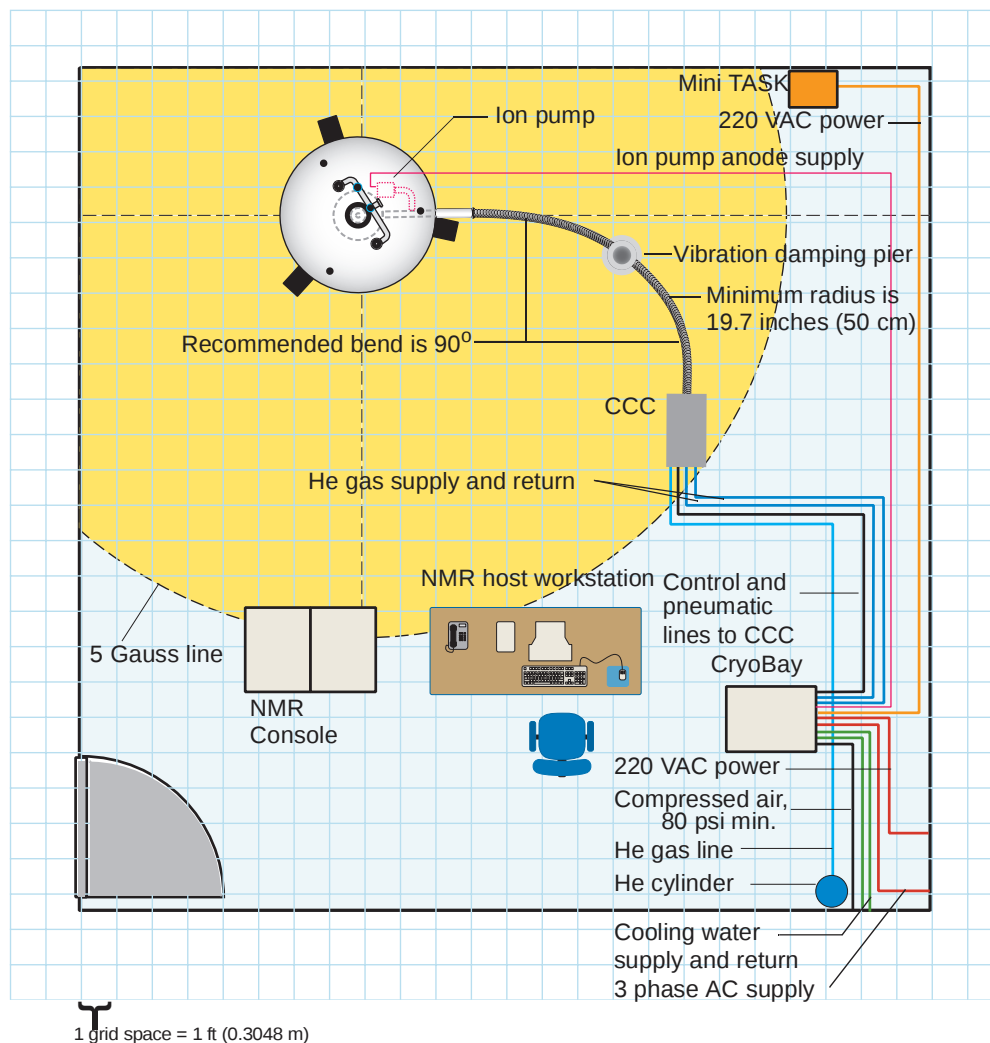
General Floor Plan for Typical Gen 2 Cryogenic System Installation
